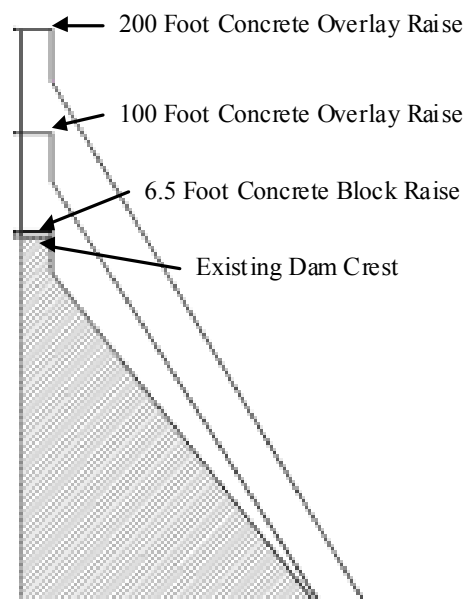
Cross section of Shasta Dam for Various Dam Raises.
